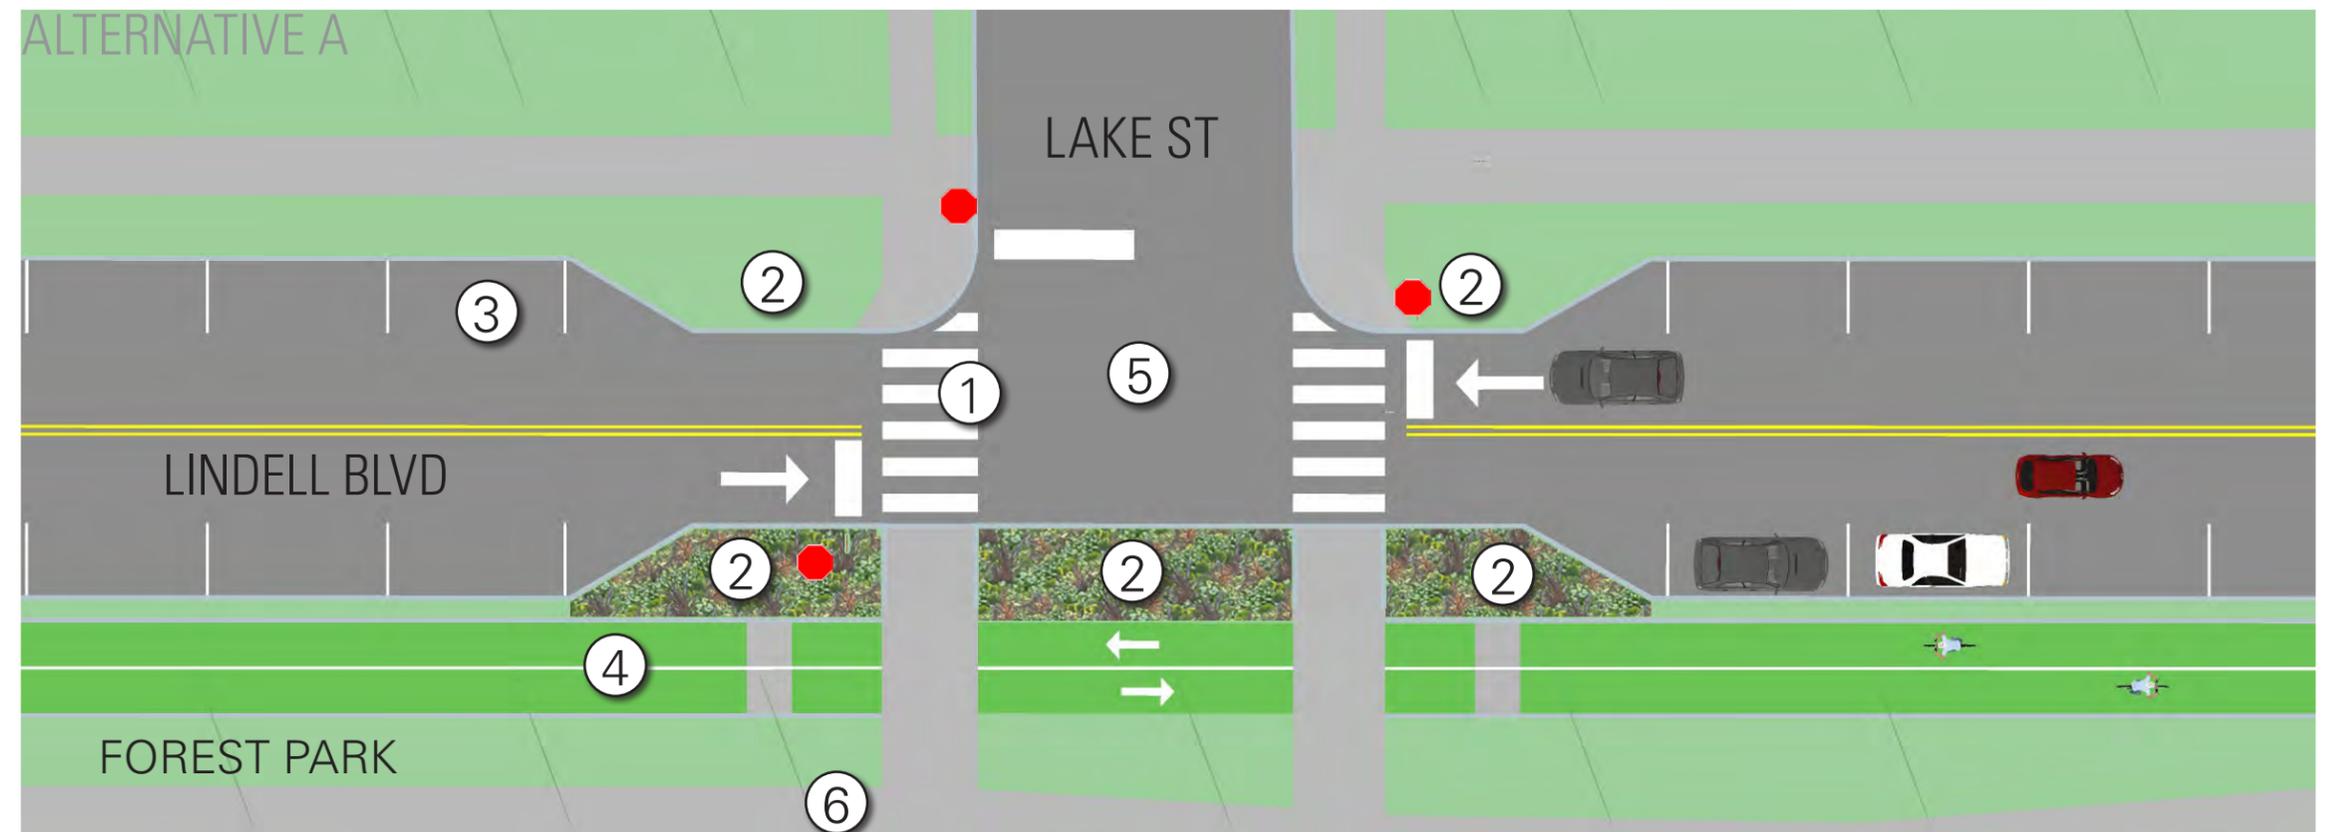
Alternative A for Lindell Boulevard: Example above is the intersection of Lake Street and Lindell Boulevard
